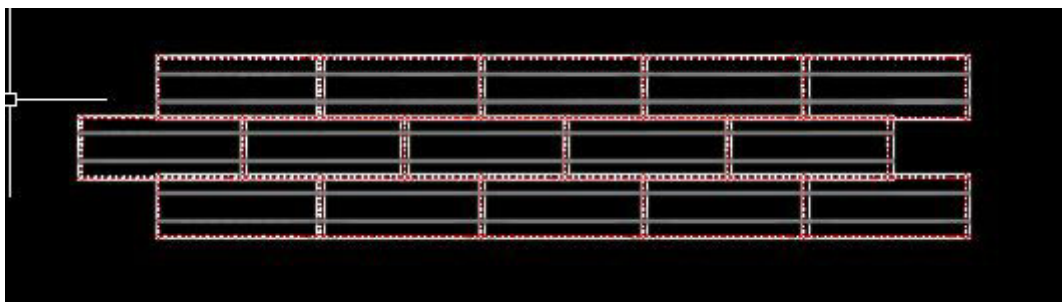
Silo Design Drawing – Wall Sheeting (AutoCAD)
